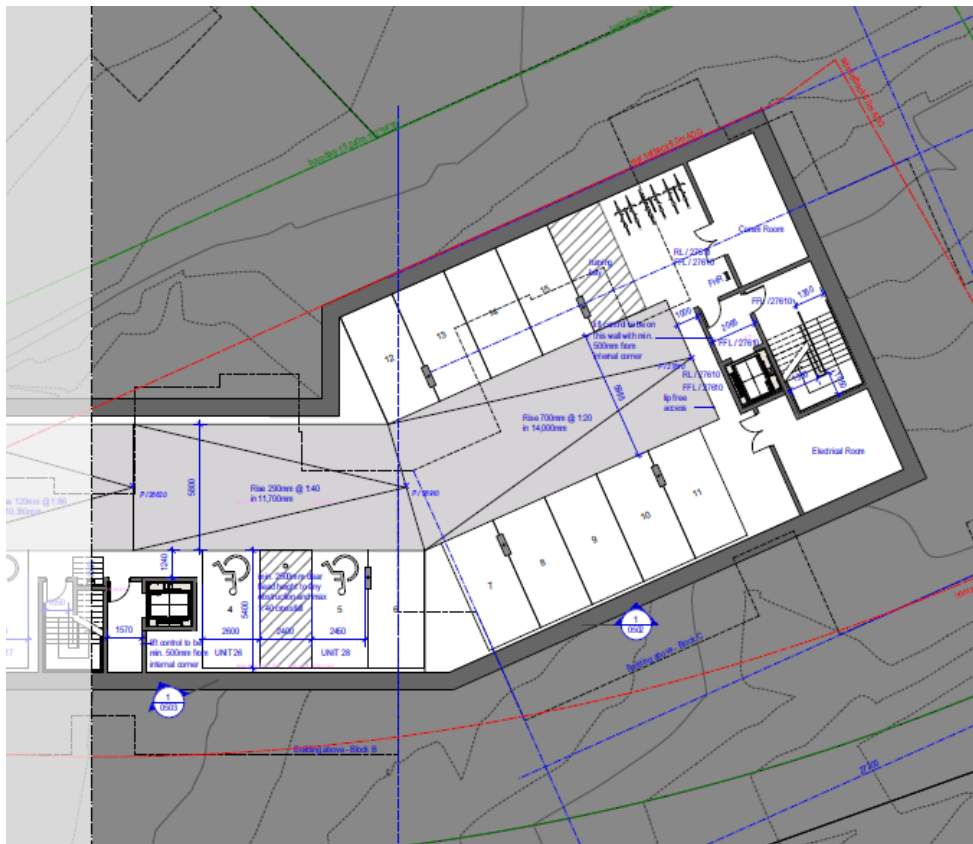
Extract from Architectural Plans – Level 00 - Part 2 (Source: Architectural Plans, Kennedy Associates Architects, dated 29/08/2024)
